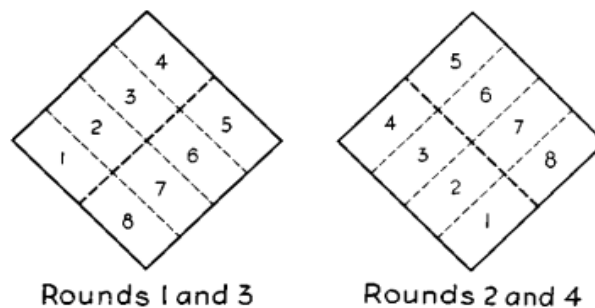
Order Of Tamping In Molding of Test Specimens ASTM C 109
